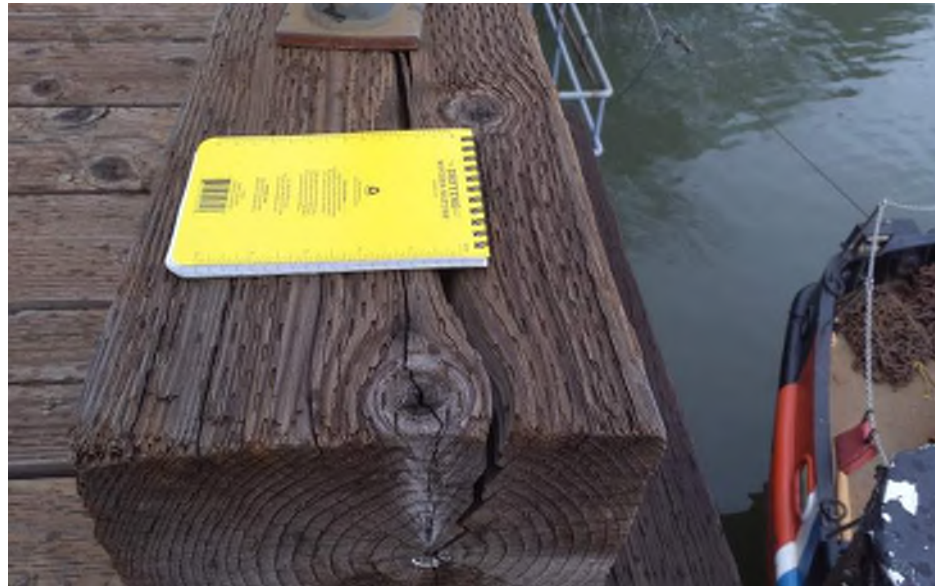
U.S. Coast Guard Dock and Pier Superstructure
